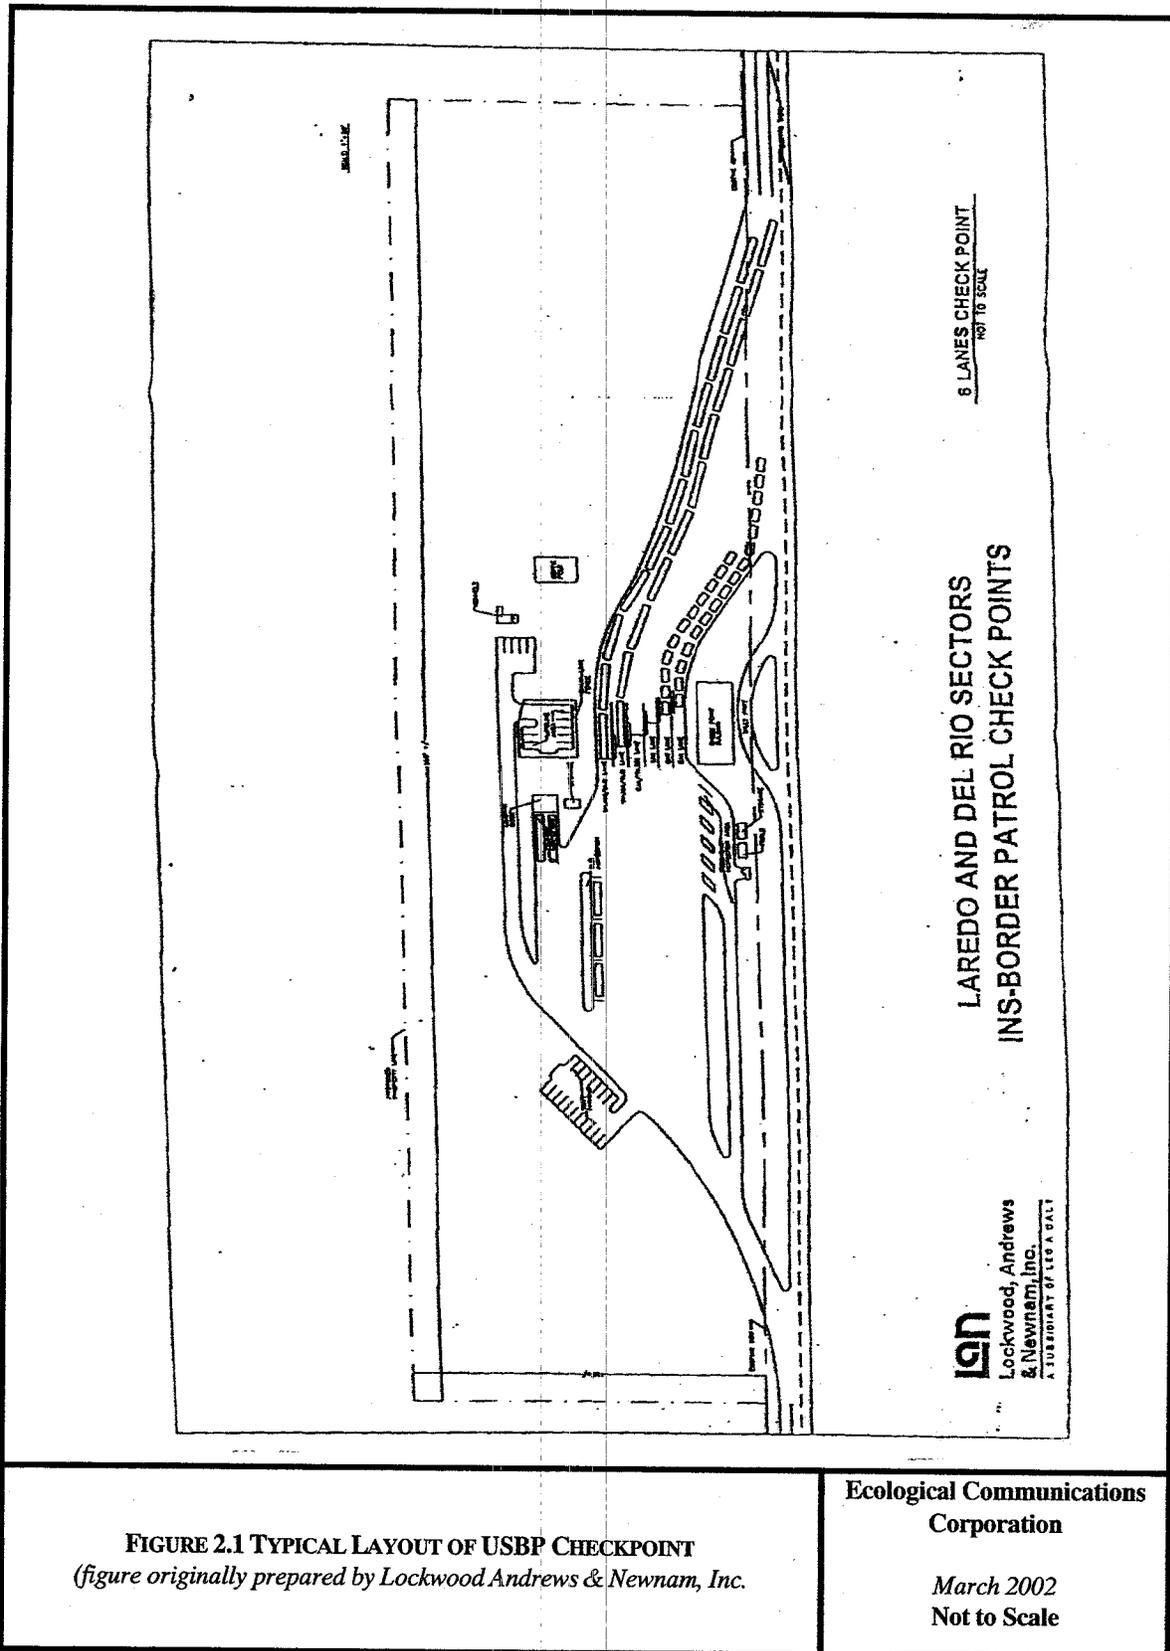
TYPICAL LAYOUT OF USBP CHECKPOINT
